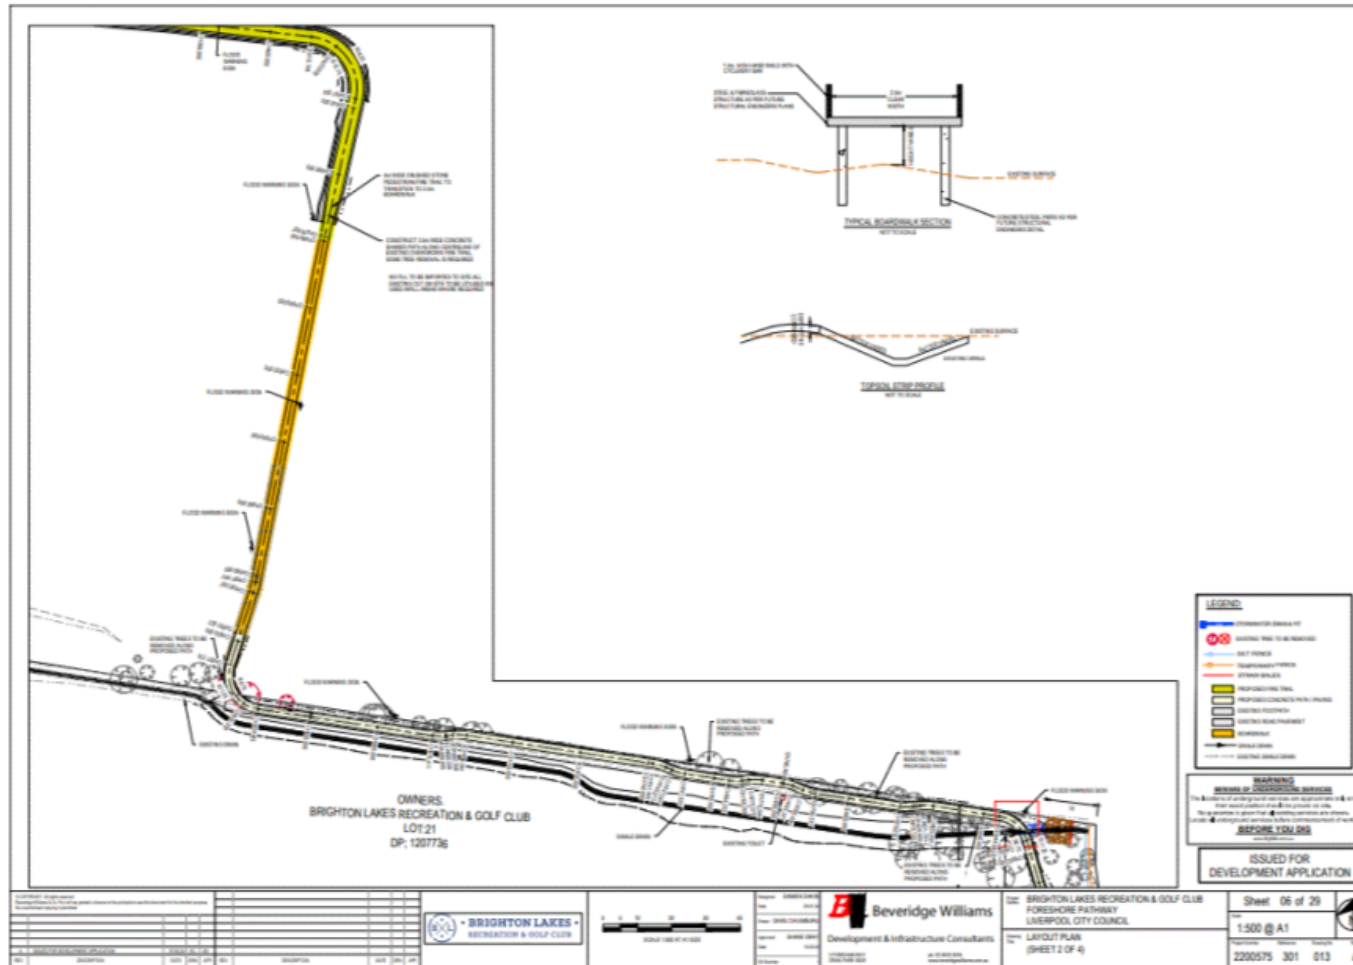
C - A schematic indication of the elements of the proposed pathway construction in Stage 3 (Boardwalk), and the northern section of Stage 2 (for detail see Beveridge Williams layout plans 2024)
